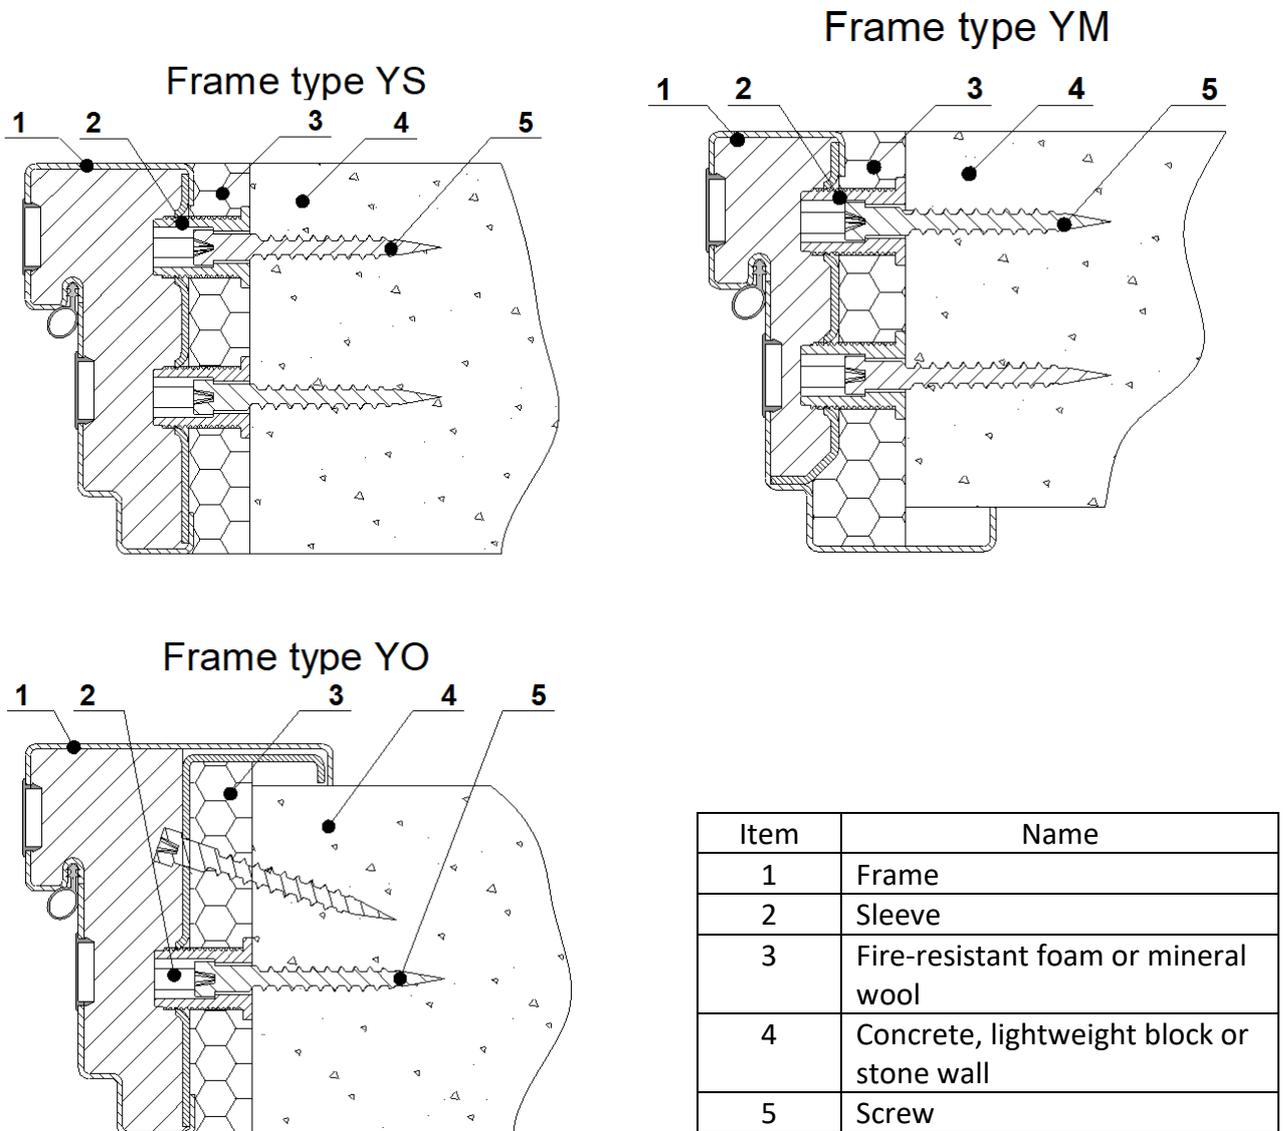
Fixing the door frame into a concrete, lightweight block or stone wall
